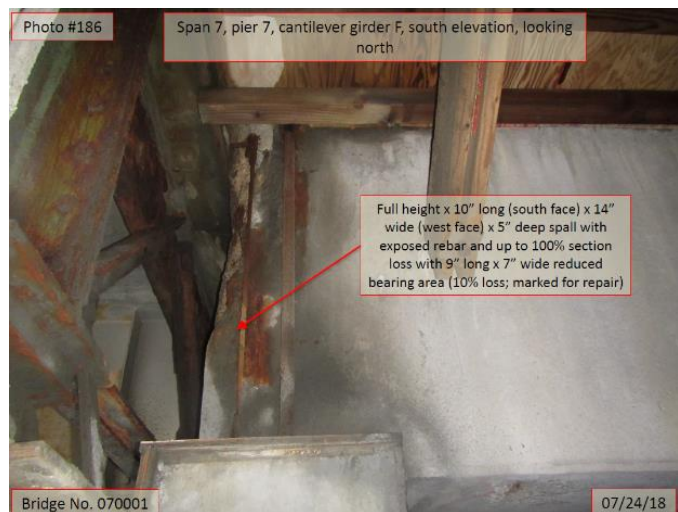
DEEP SPALLING AND EXPOSED REBAR, SPAN 7
